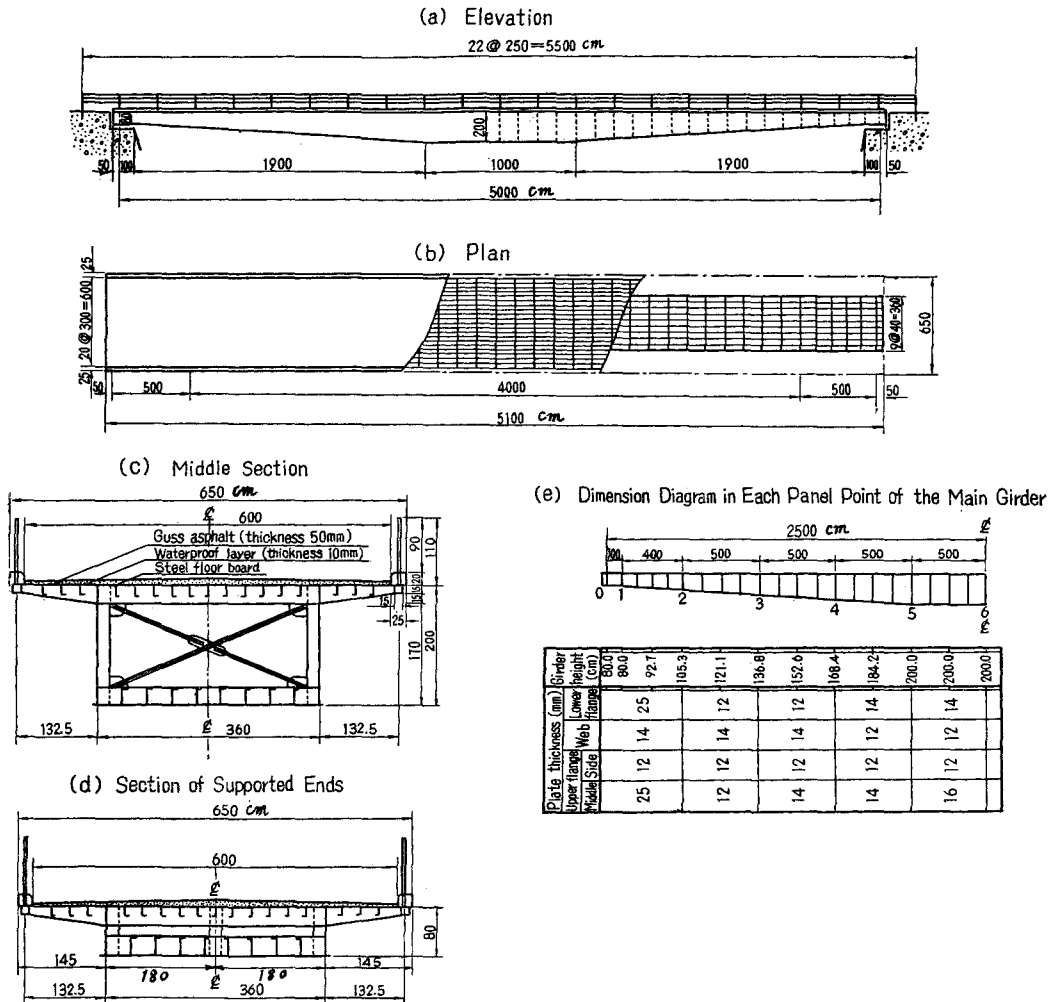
Out line Plan of a Box Girder Bridge with Varying Sections and Steel Floor Plates.
